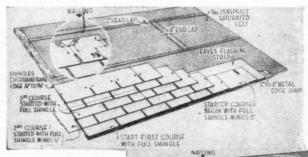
Three tab, square-butt strip shingles. Cutouts are centered over tabs in preceding course
